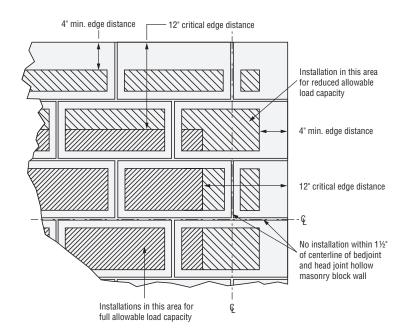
Stainless-Steel Titen HD Screw Anchor Installed in the Face of Hollow CMU Wall Construction
